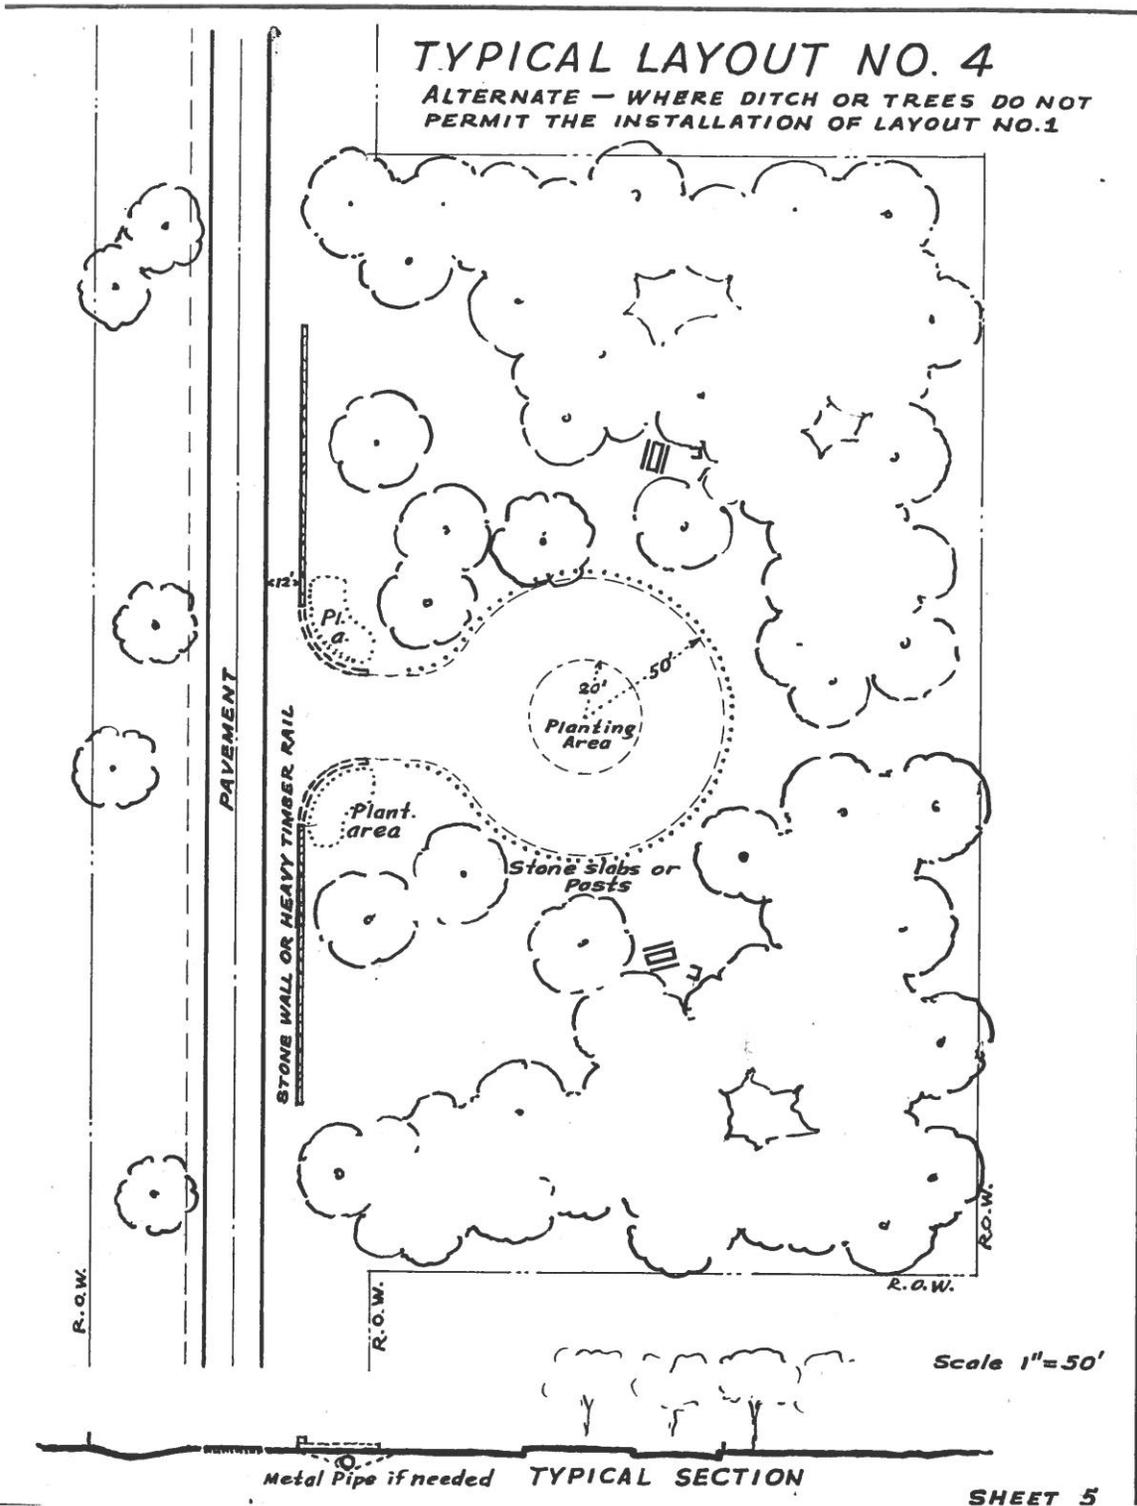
Typical roadside park layout no. 4 designed by Gubbels (1936).
